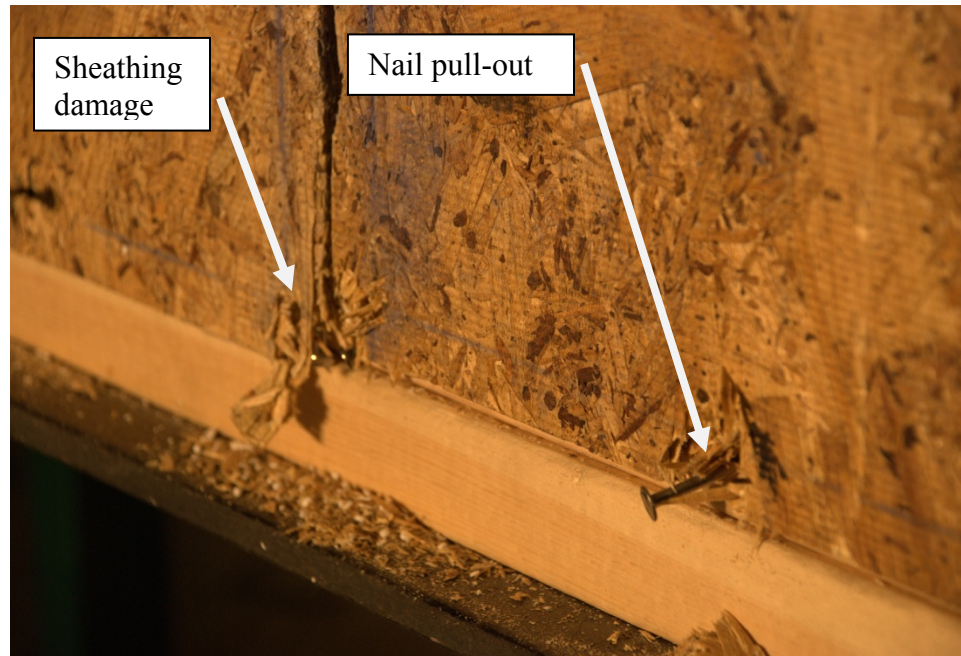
Nail pull-out and sheathing damage along base plate of Specimen A1Internal-4C after Fatigue 3
